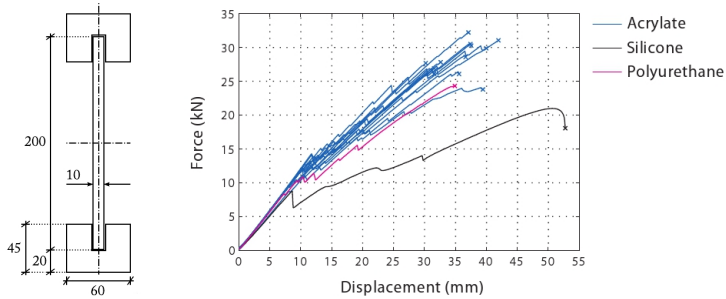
Cross-section of hybrid timber-glass beam specimens (left) and force-displacements curves (right) [33]
